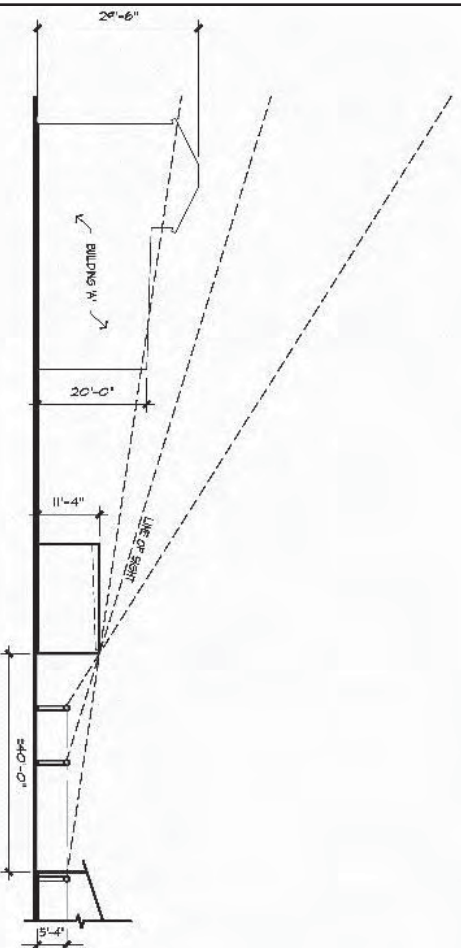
Project Plans (Conceptual Fence and Wall Plan)
